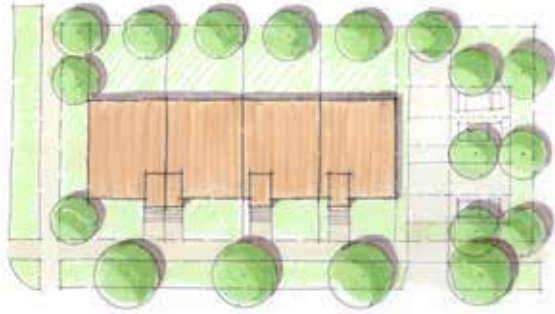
Illustrative example of townhouses on a corner lot, facing to the side, with modest front setbacks and landscaped rear yards.
